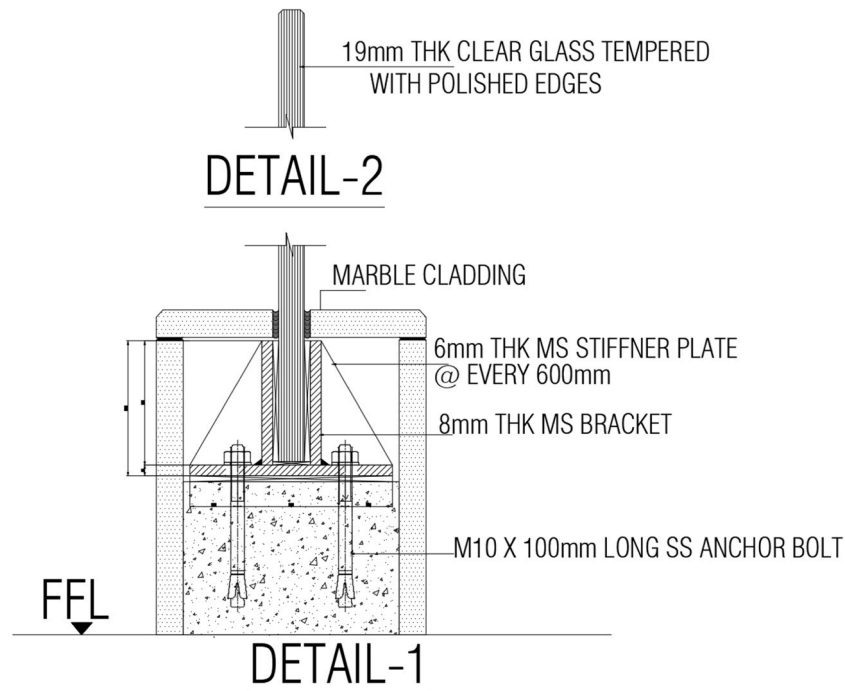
Detail cross-section of a balustrade fixed on the floor.
